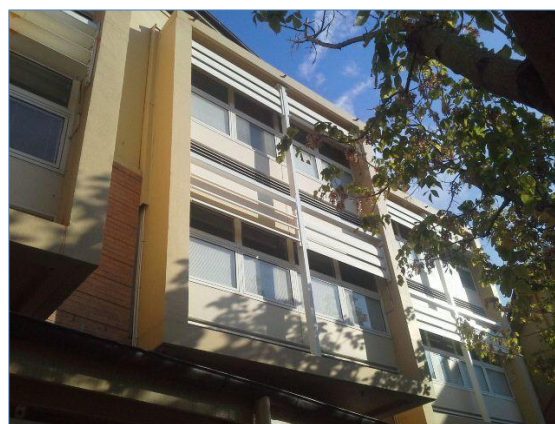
Level 03 head master office wing external perimeter - Fibre cement eave lining
